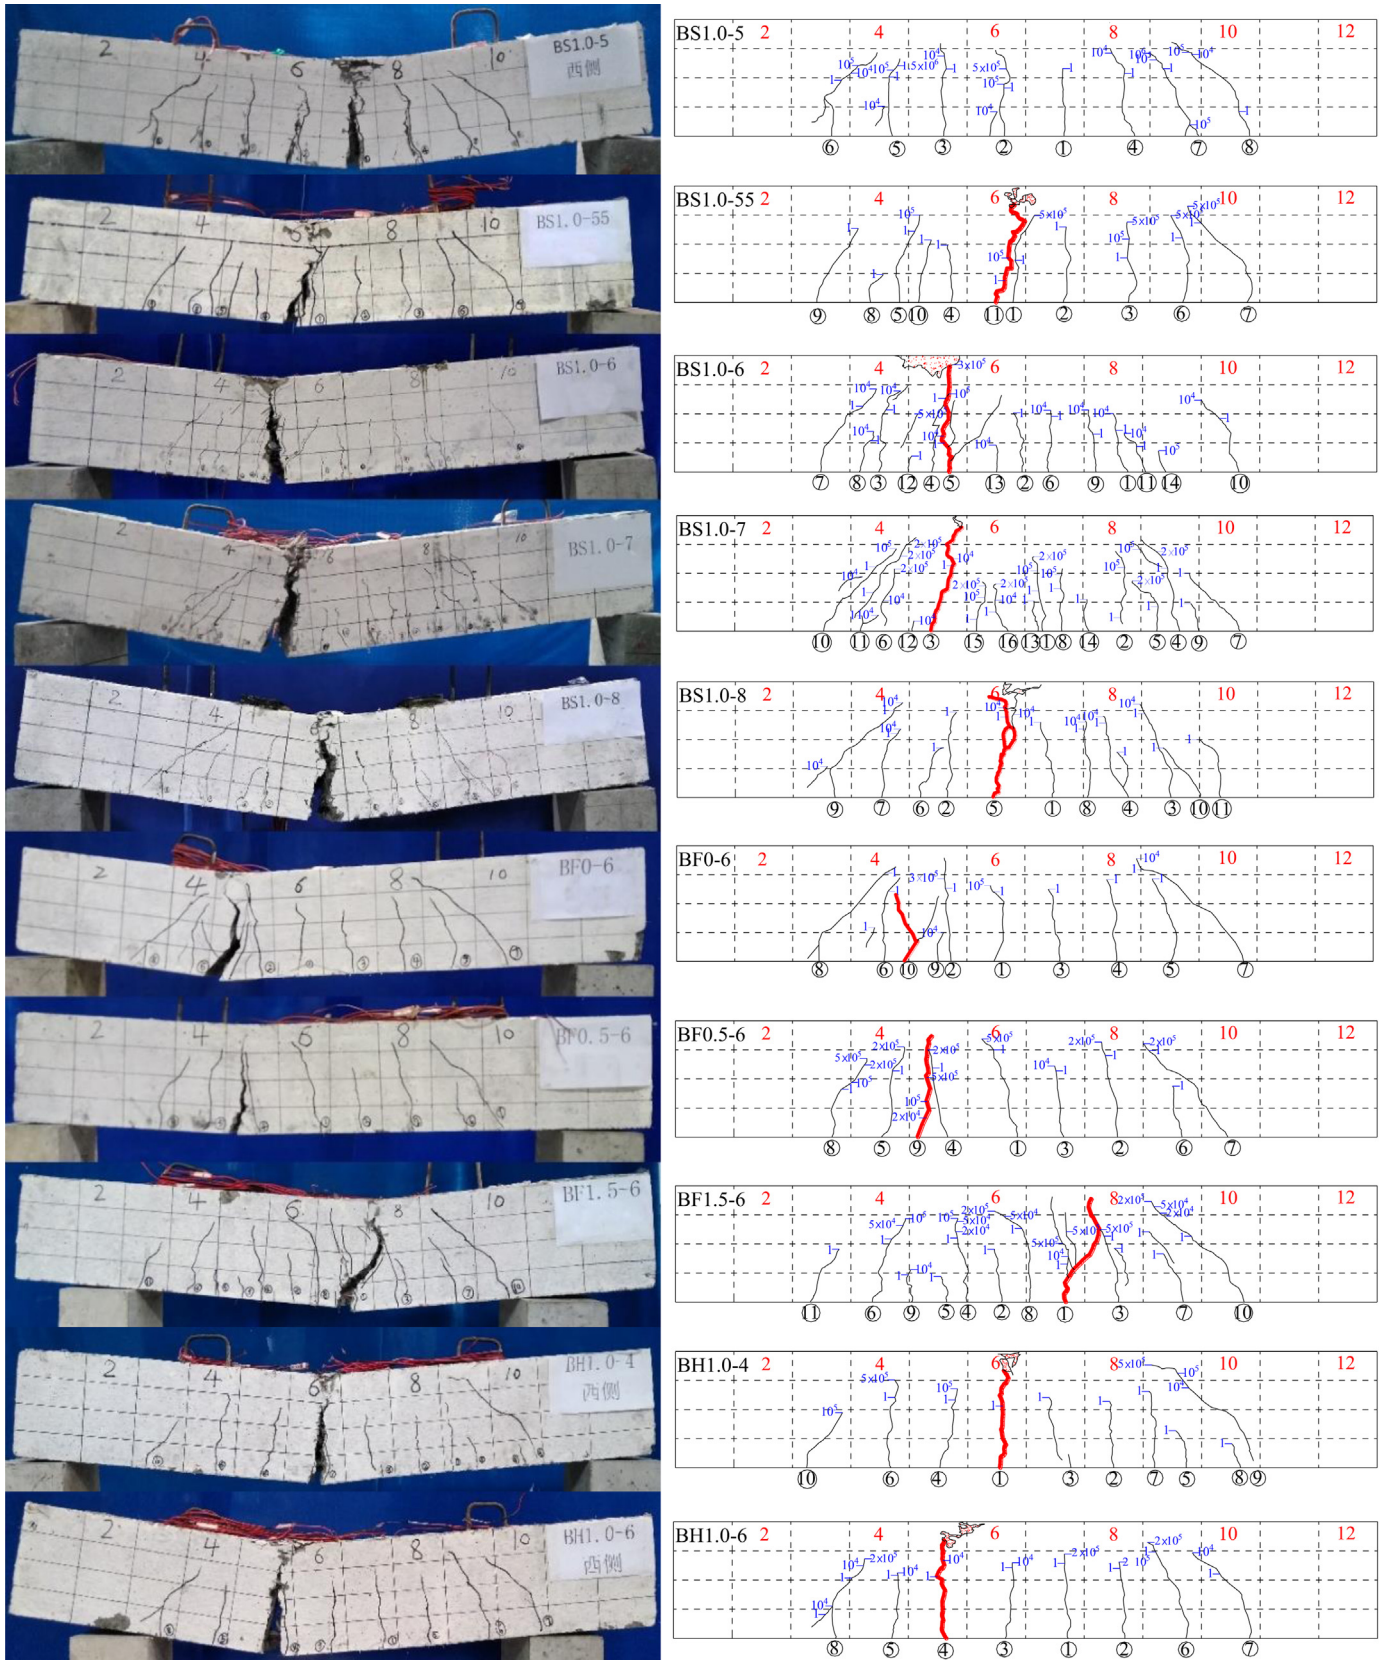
Final failure pictures and crack distributions of the beam under fatigue loading.
